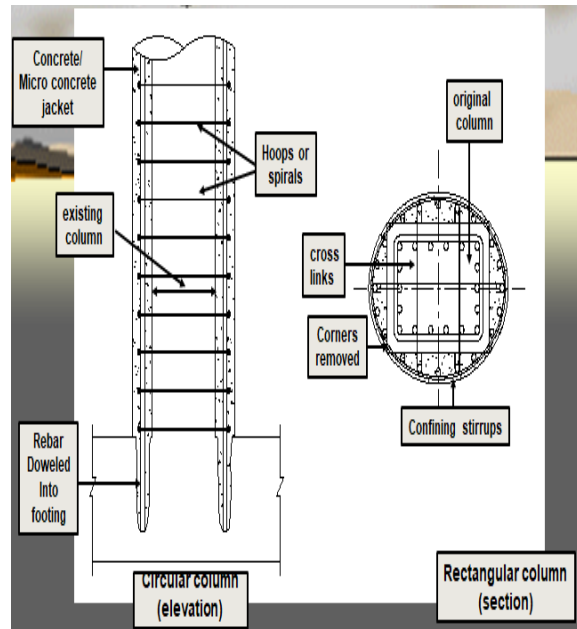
Shows Confinement of Columns By Concrete Jacketing
